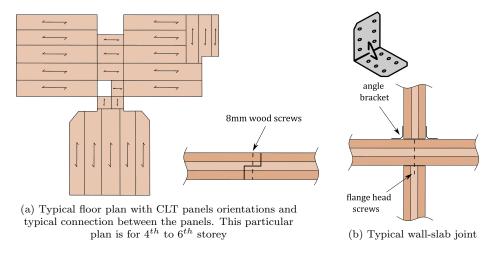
Key structural details of the Yoker CLT building (after [8]).
